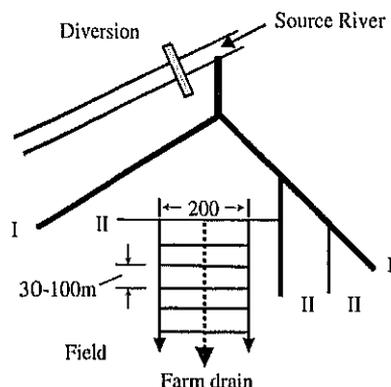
Standard Layout of Irrigation and Drainage System in Japan.
